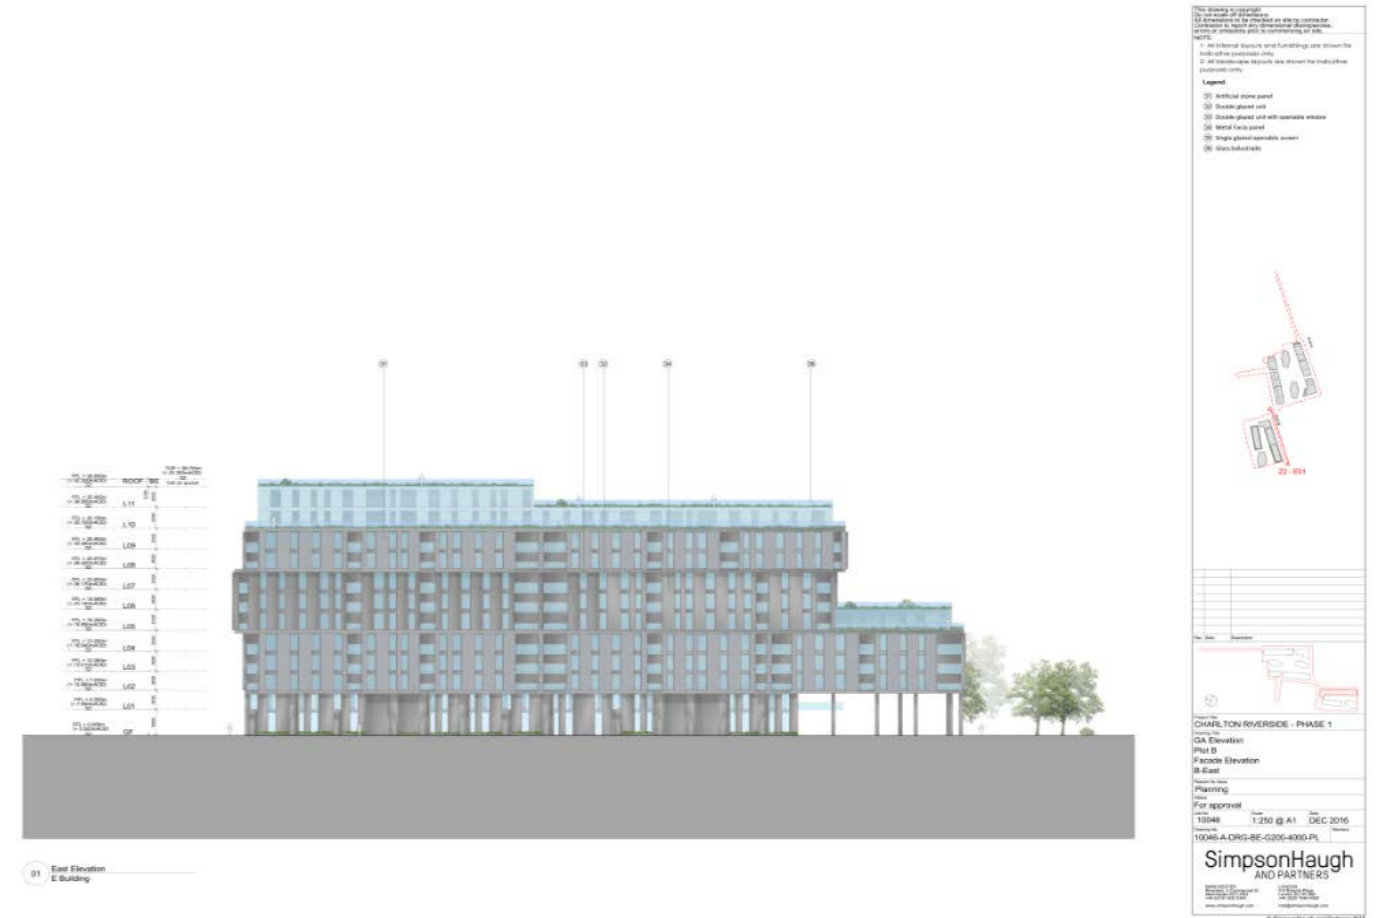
Plot B, Building BE Proposed Façade Treatment
